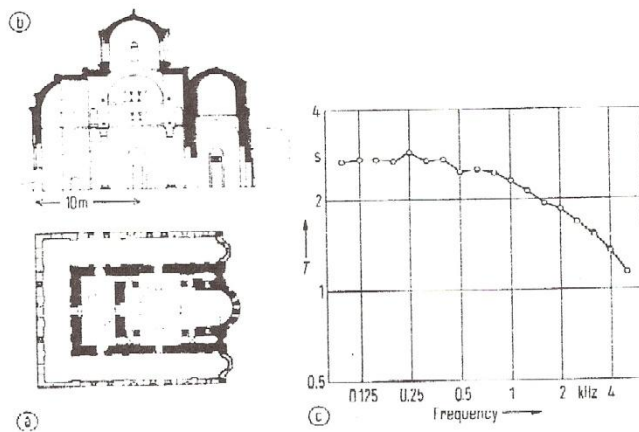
Church of St. Panteleimon. (a) Ground-floor plan, (b) cross section and (c) reverberation time  $T$ .
